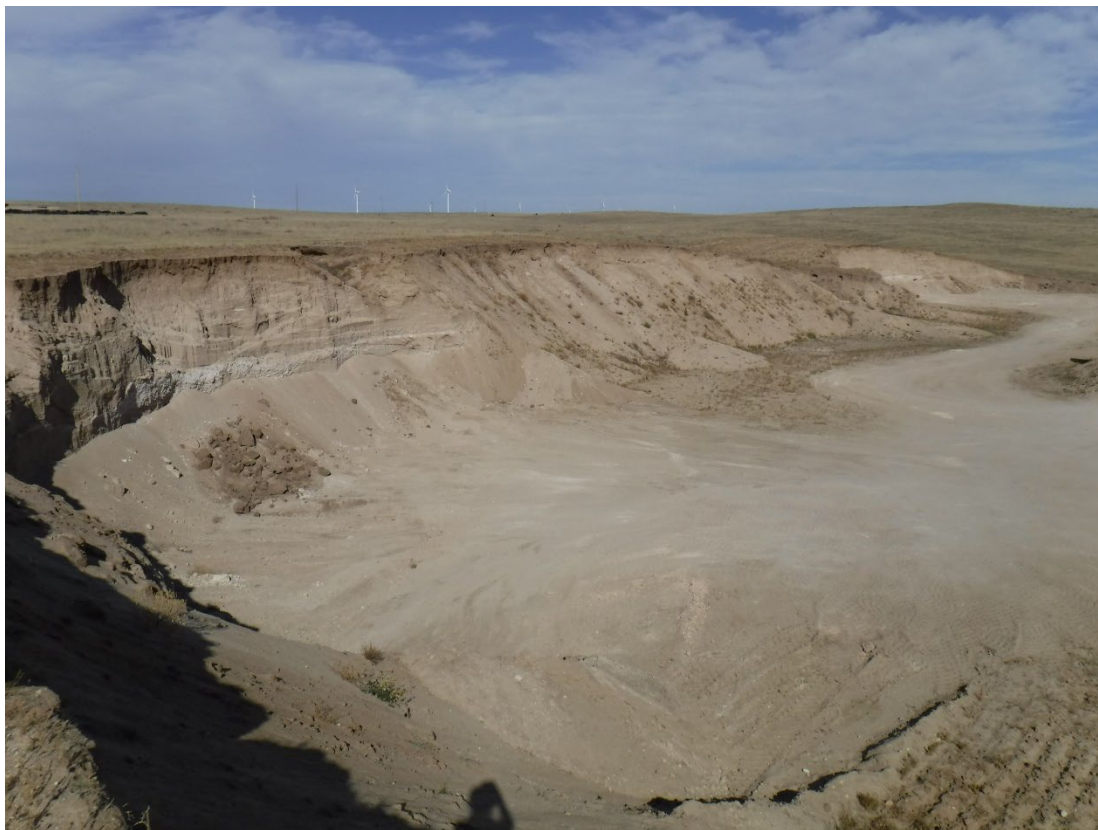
Typical extraction face looking north-northwest, approximately 15-feet in height
